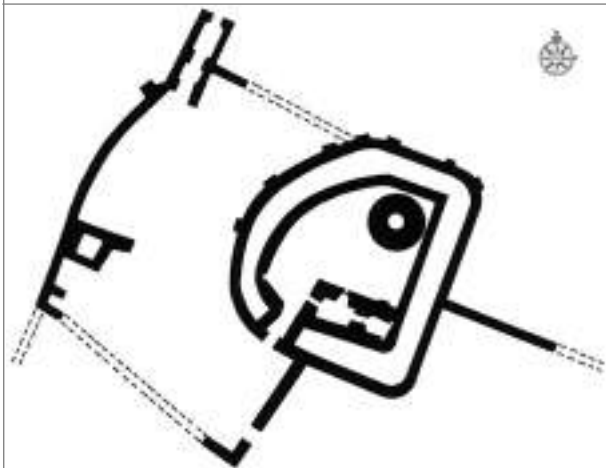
Reconstruction and plan, source: medievalheritge.com
